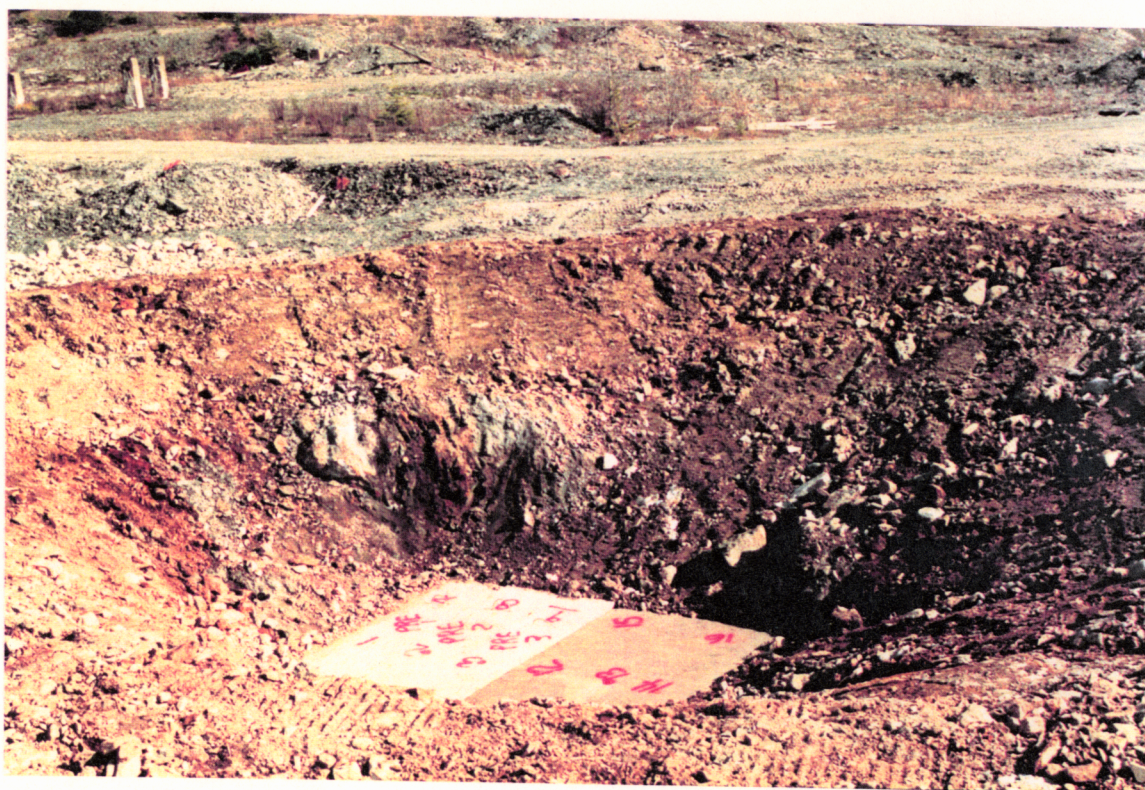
No. 2 Raise closure cap showing excavation and perimeter safety berm.
